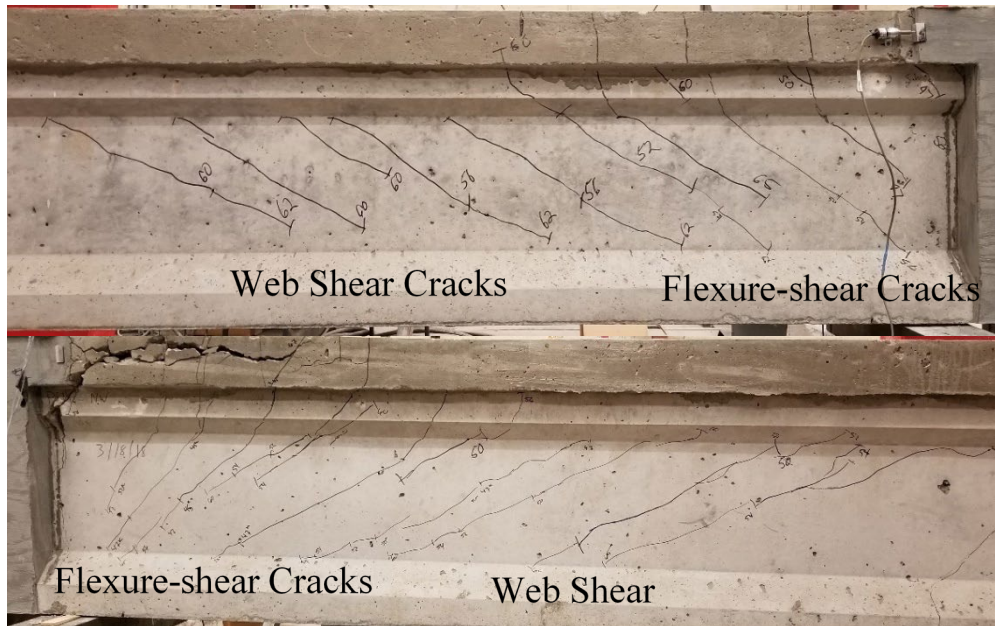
NC2-N girder with flexure-shear and web shear cracks (top) and NC2-S girder with flexure-shear and web shear cracks (bottom)
